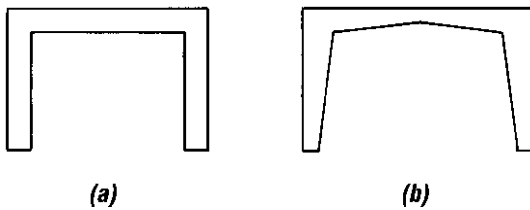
Rigid frames: (a) with prismatic members; (b) with haunched beam.
